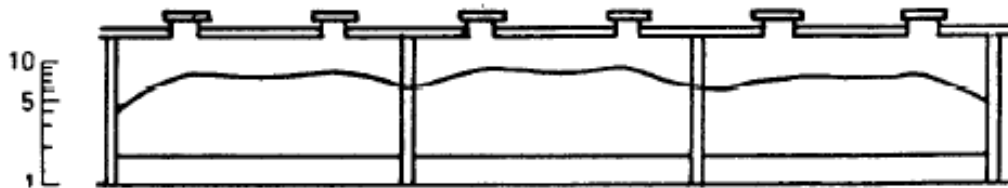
CONTINUOUS HORIZONTAL ROOF LIGHTS
